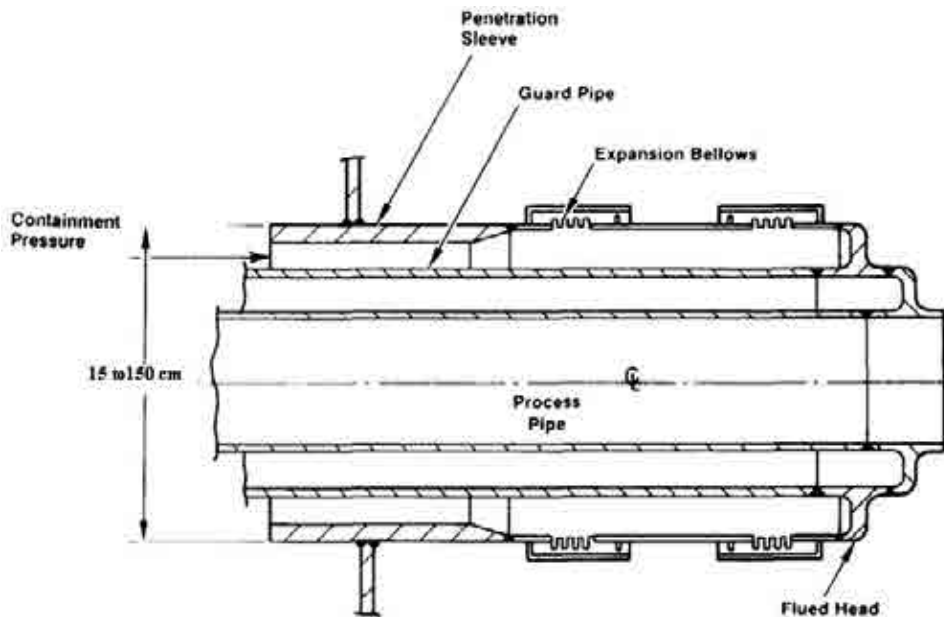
Example of process piping bellows showing pipe penetration through containment (adapted from Ref. [13]).
